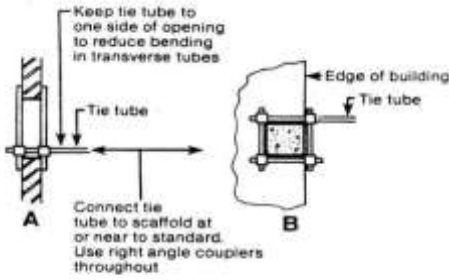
Box tie. A. Vertical or horizontal section through wall. B. Horizontal or vertical section through structural member.
